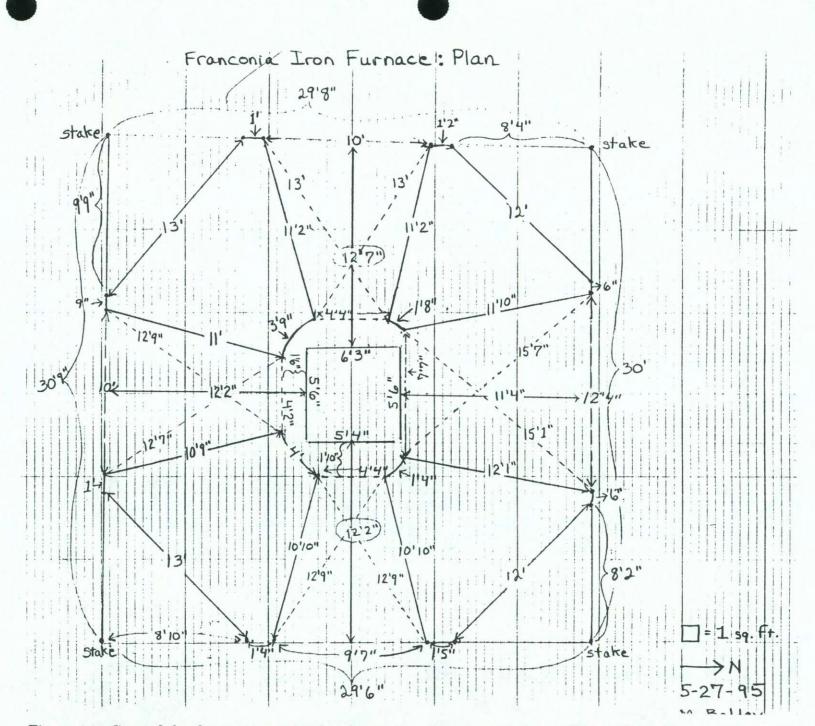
Ground-level measurements of arch openings, hearth, and corner pillars (Megan Battey field sketch).
